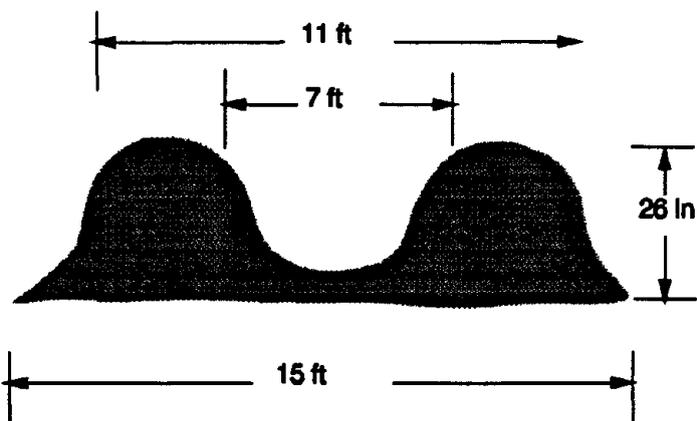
Final geometric dimensions of concrete mine support structure number 1
